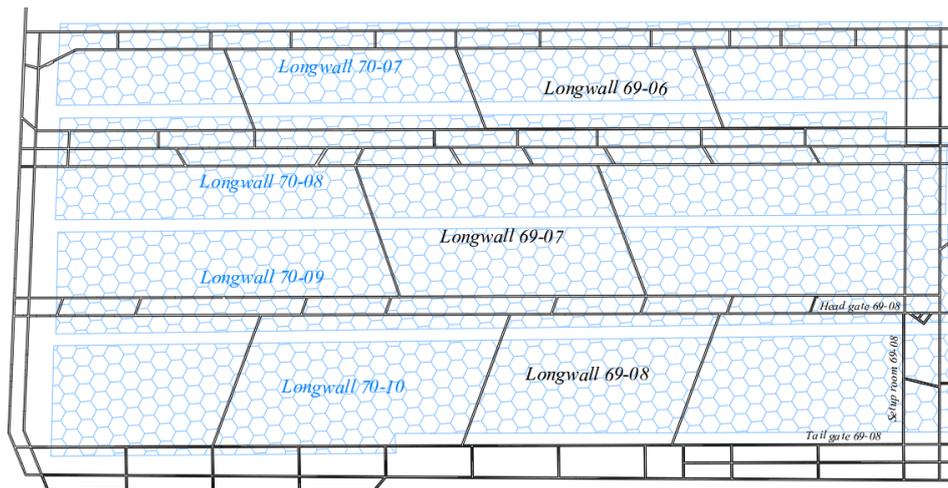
A mine layout for seam № 69 and the boundaries of longwall panels in seam № 70.
